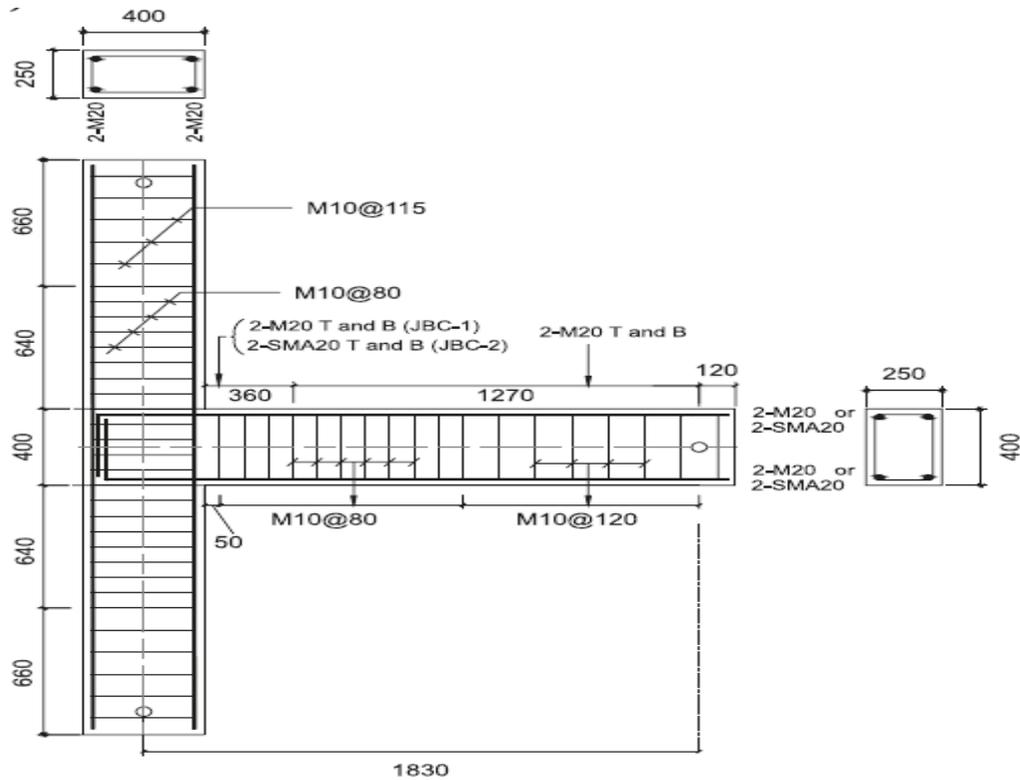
Reinforcement details of specimens JBC-1 and JBC-2 (all dimensions are in mm)
